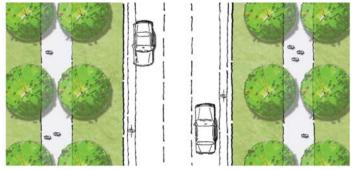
A Plan of typical three-lane Campus Greenbelt
